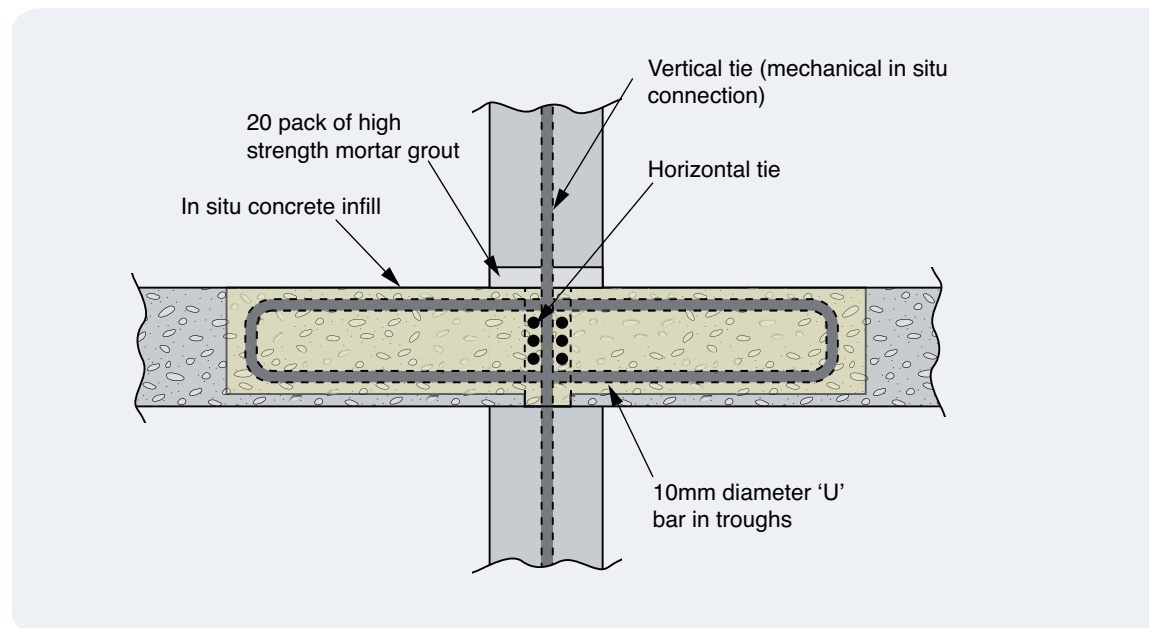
Precast wall connection with ties. Typical section through internal wall (load-bearing).
